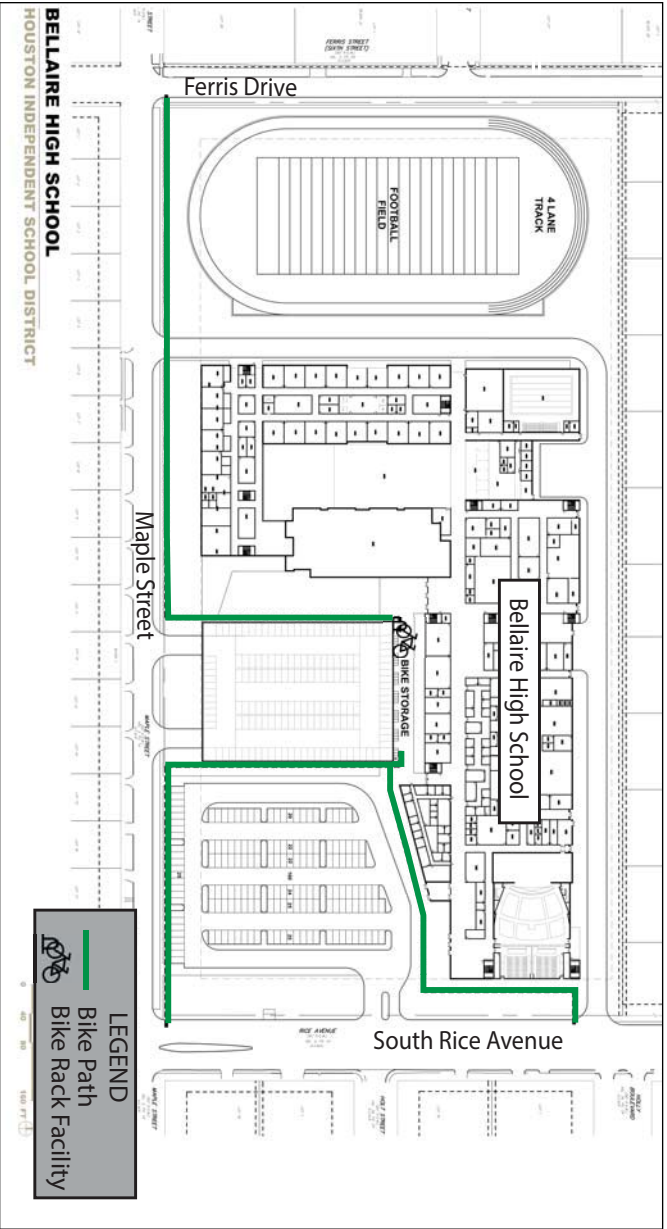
Bike Facilities Planned at Proposed Bellaire High School
